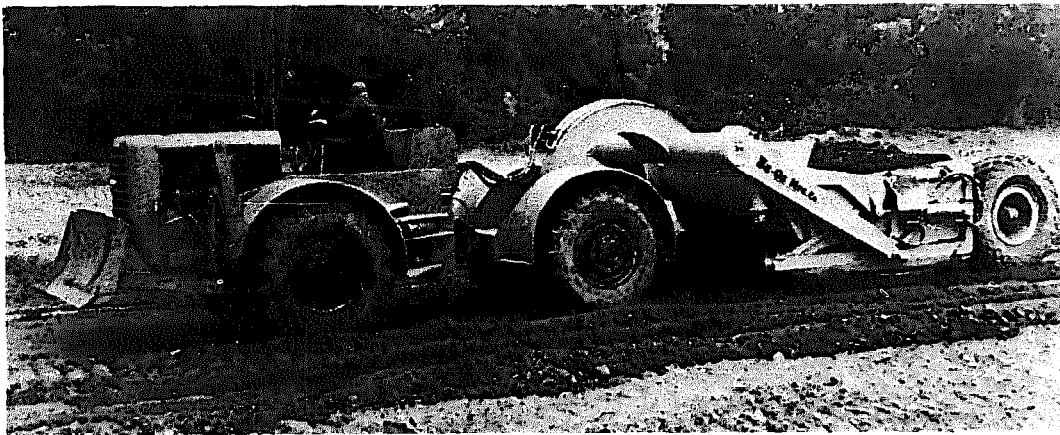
Small two-wheel scraper used with a four-wheel tractor.
